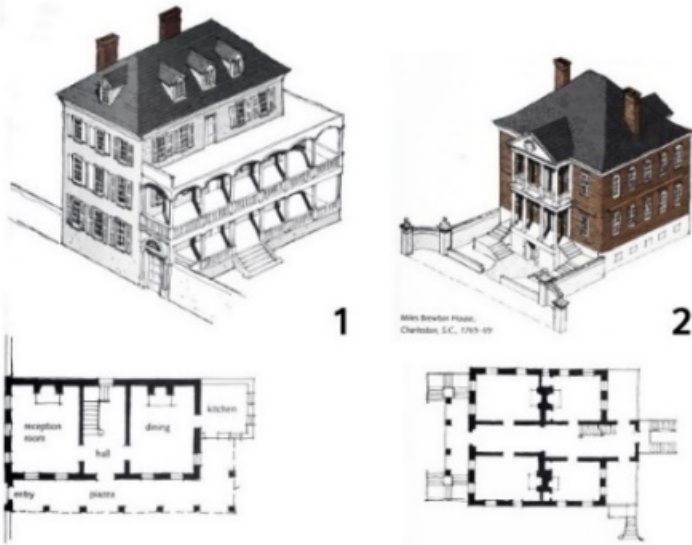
Two types of Charleston houses; 1) Single house perpendicular to the street with a flight of stairs, 1750-1863, 2) Box-like type Double house facing the street, 1730-1863 (Harris, 2006, p. 199; Foster, 2004, p. 155, 159).
